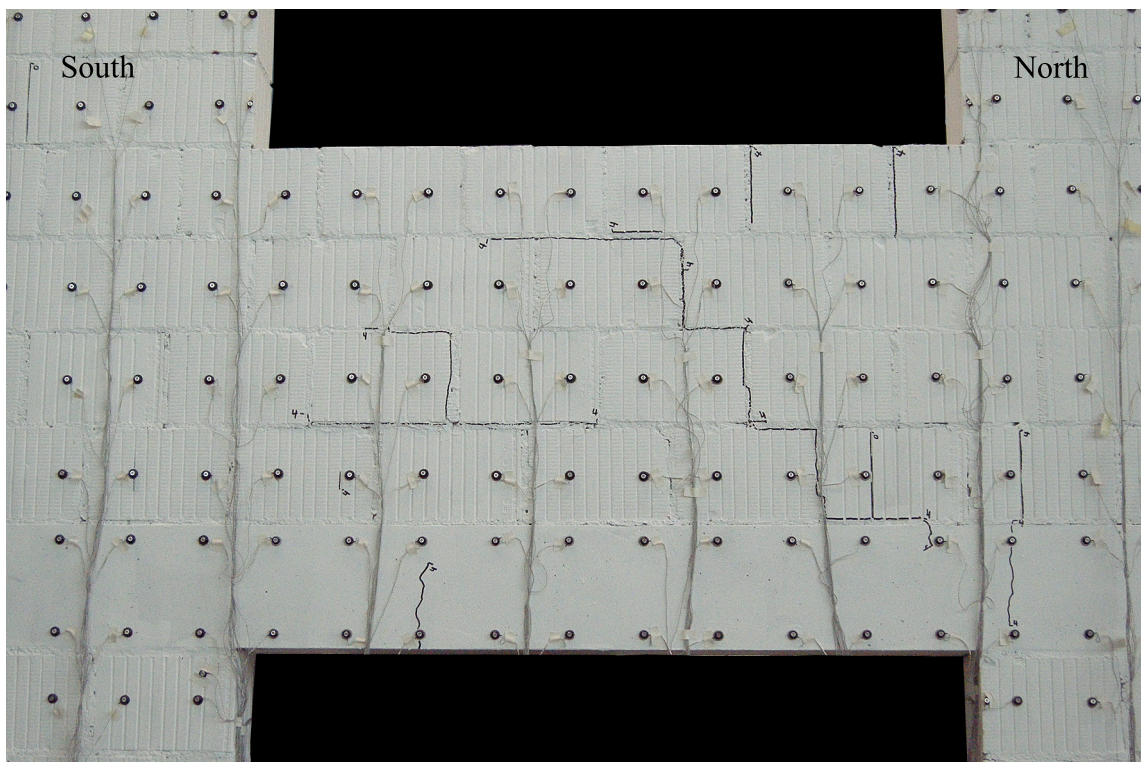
TU2: Crack pattern of spandrel at LS 4 when first cracks appeared. Drift towards North with $\theta_{nom} = 0.1\%$.
